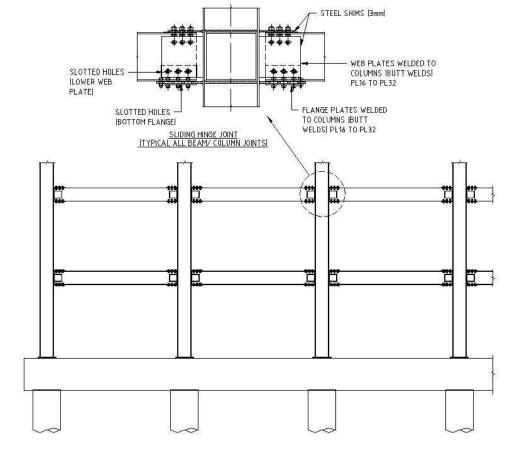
Sliding Hinge Joint at a Beam Column Joint.
